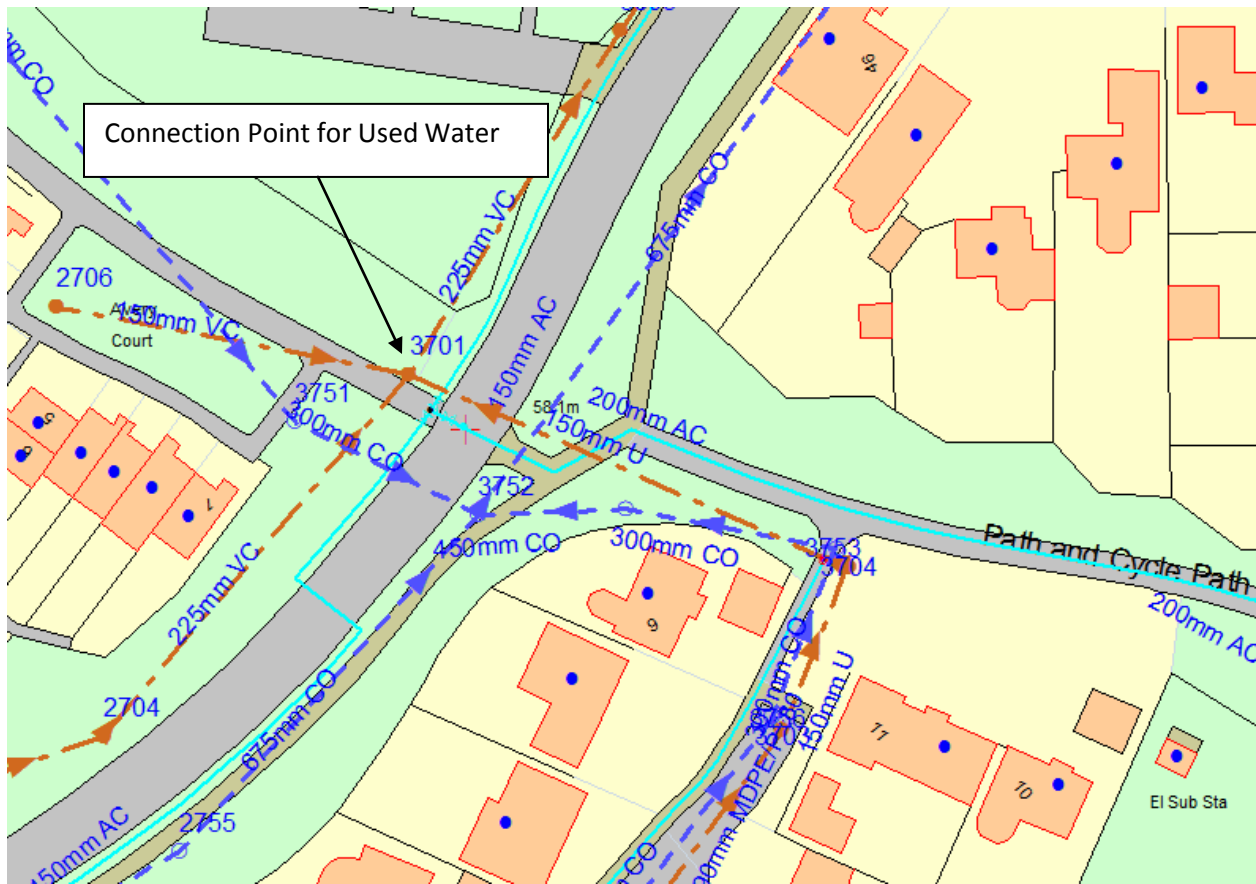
Showing your used water point of connection at manhole 3701 with a Cover Level of 58.18m and an Invert Level of 54.99m
